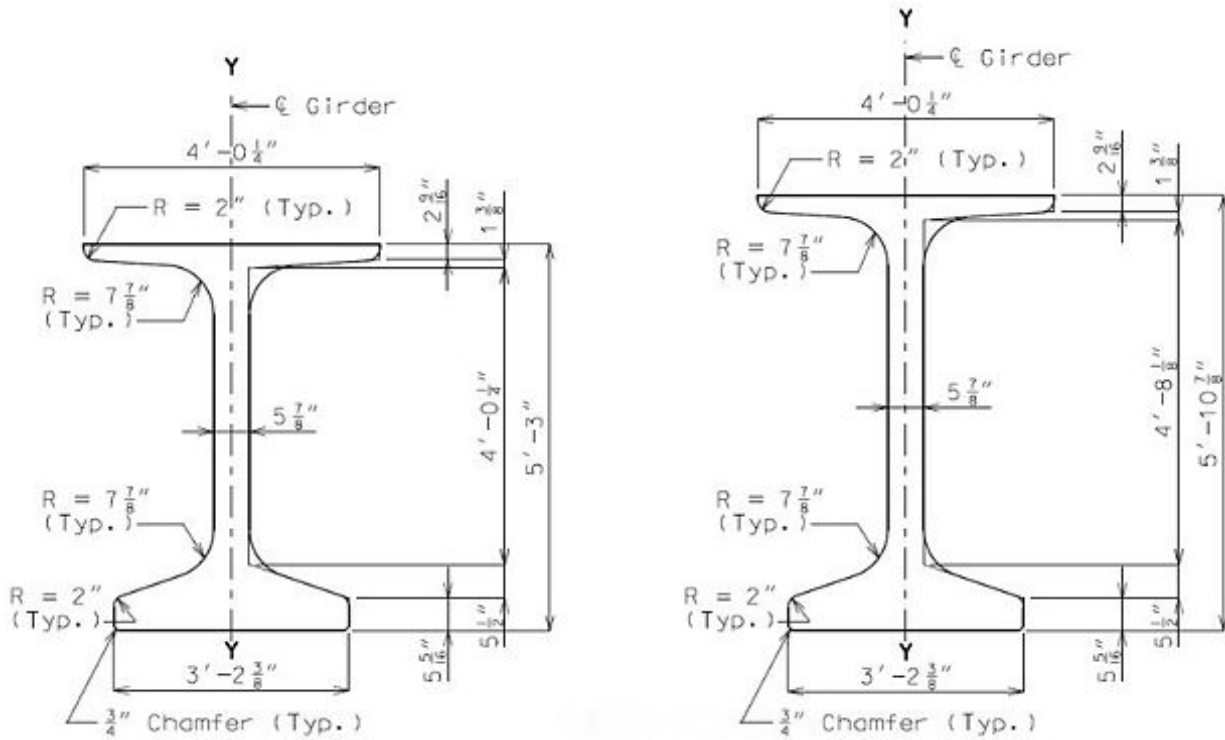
Typical Bulb Tee cross-section shapes for use in pre-stressed concrete girders (MoDOT, 2018)
